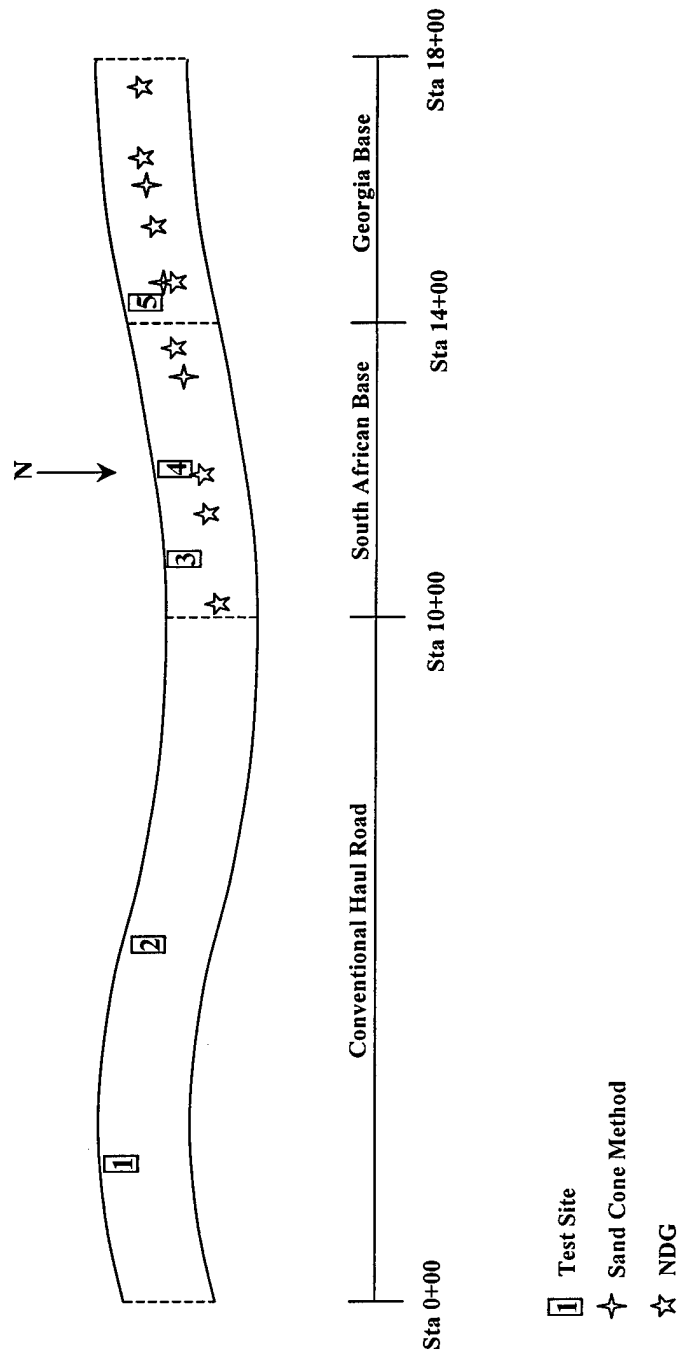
Locations of Sand Cone and NDG tests at the haul road
